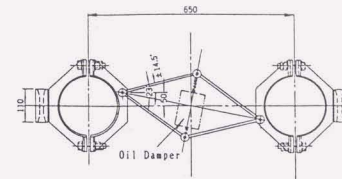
Spacer-damper of the Yokohama Bay Bridge
